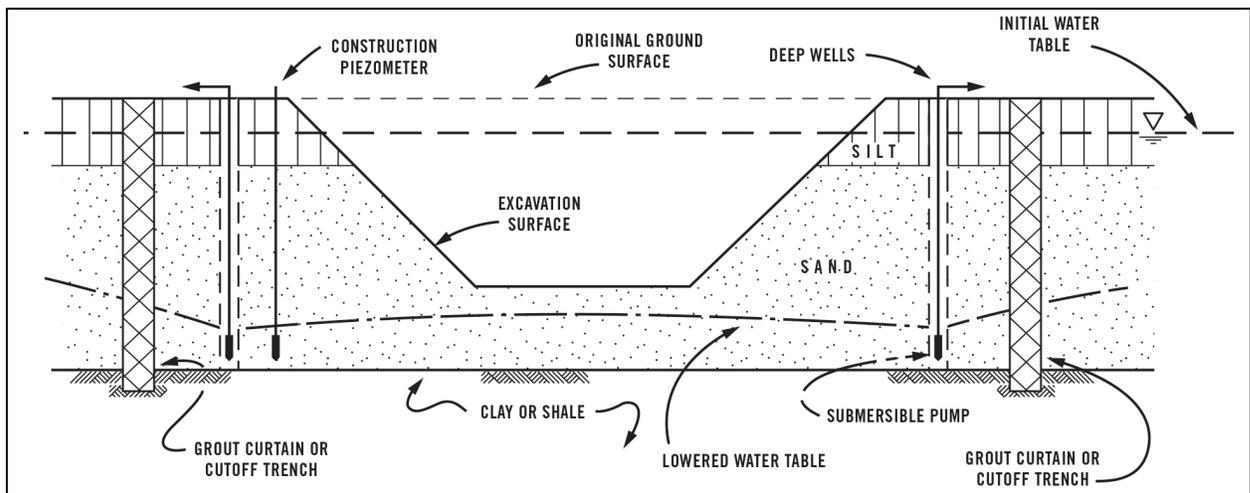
Grout curtain or cutoff trench around an excavation (Adapted from TM 5-818-5)
